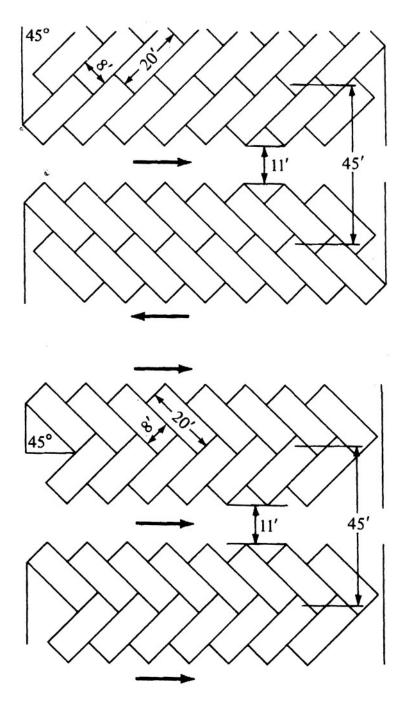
Herringbone layout of parking Stalls in an on-surface lot.
